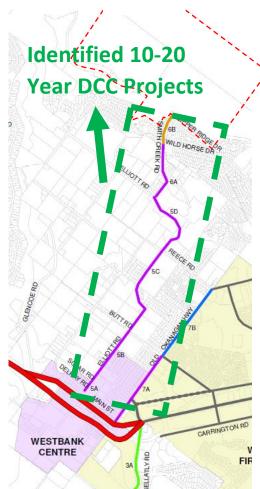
Road DCC Study Plan (Rural Arterial Road Standard)
